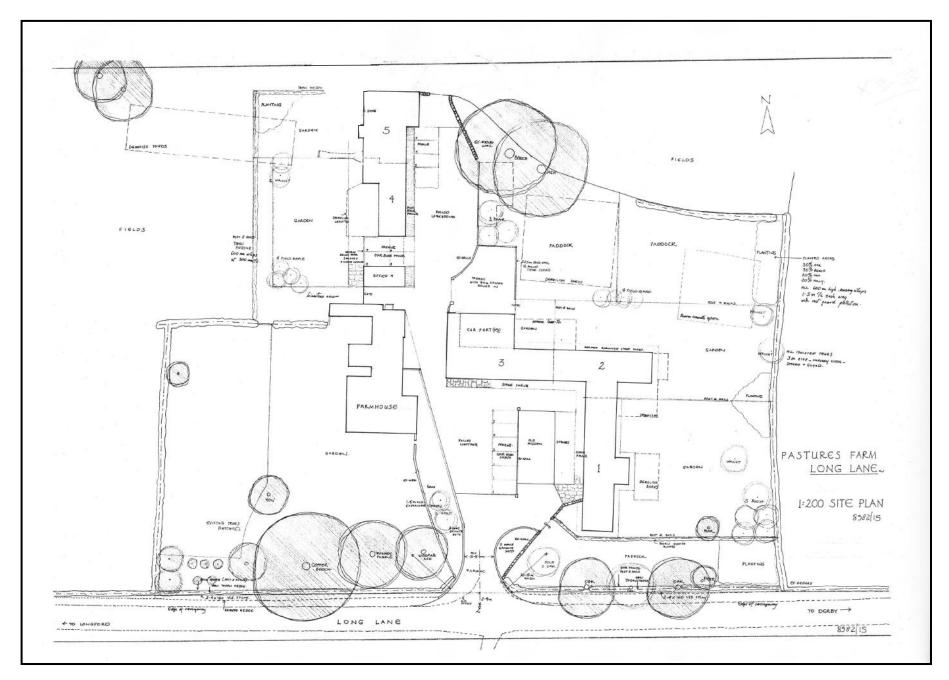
Architect's site plan of Pastures Farm, Kirk Langley, showing units numbered 1-5. Scale approx. 1:800.
